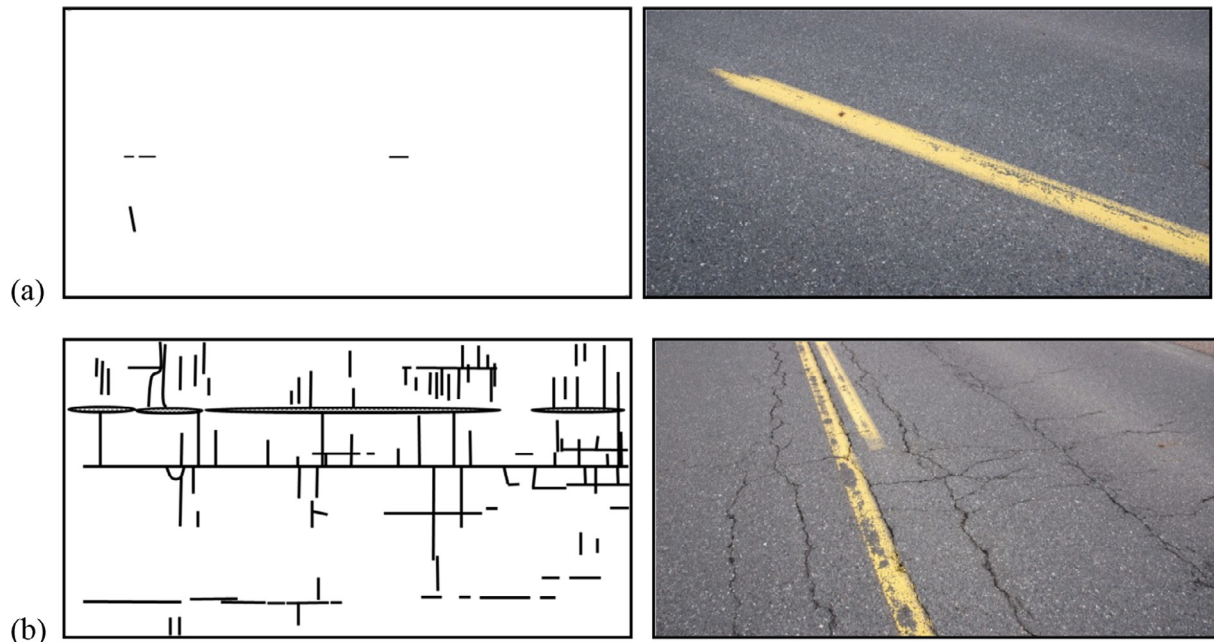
Representative 2011 crack maps and photographs from 2003 Highway 655 pavement trial: (a) section 1 and (b) section 4. Note: Both crack maps are for randomly selected 50 m stretches of pavement. Photographs were not necessarily taken in areas where cracks were mapped.
